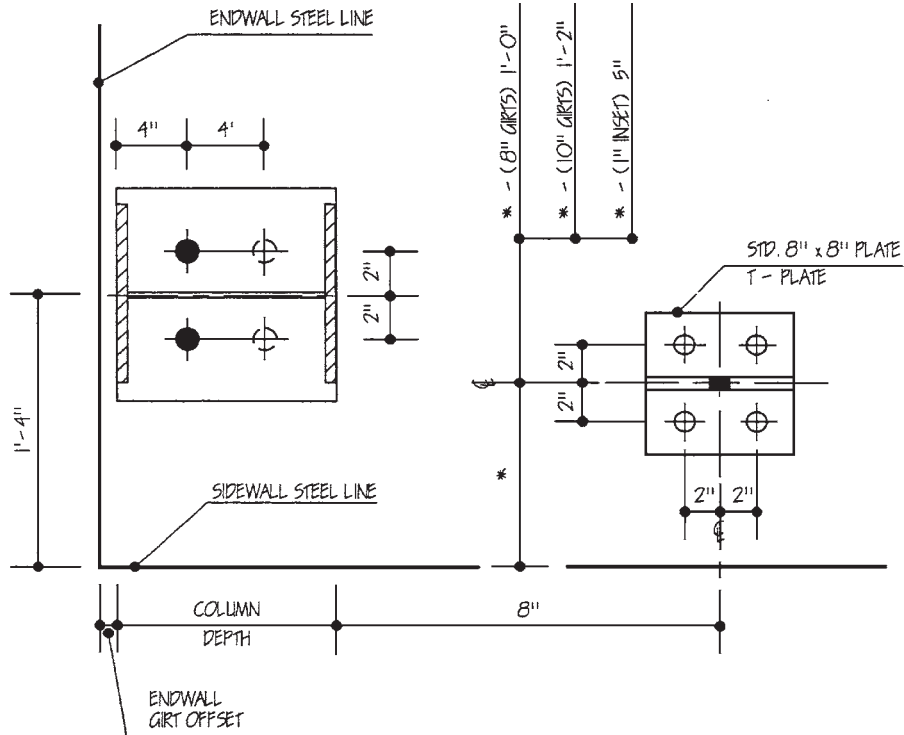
Anchor bolts at wall bracing clip. (*Star Building Systems.*)
